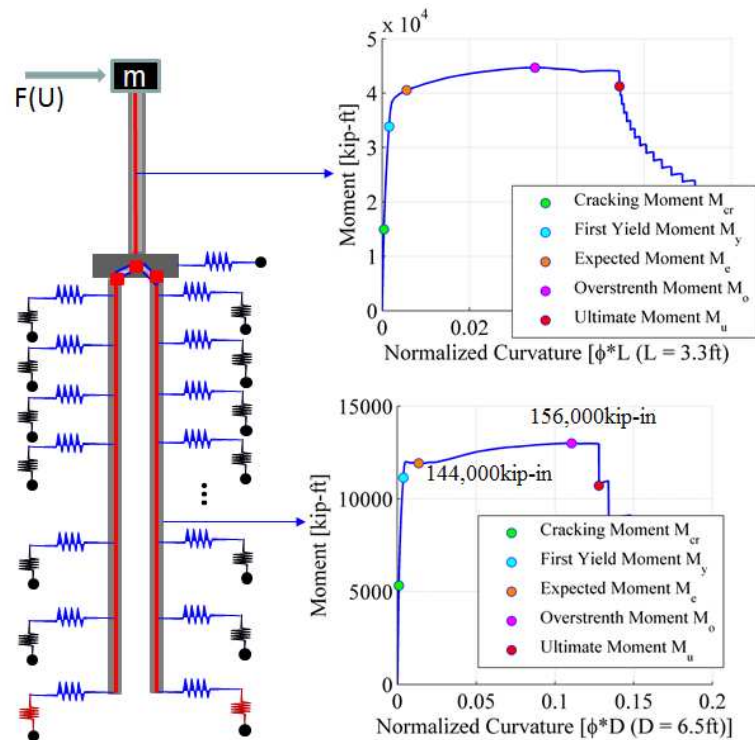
Model for single pier column founded on pile group foundation and the moment curvature relationship of the pier column and the pile
